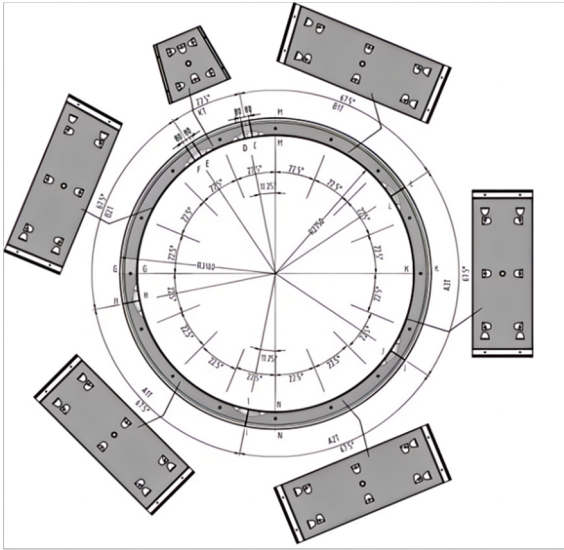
Structural Cross-Section diagram of Shield Tunnel
